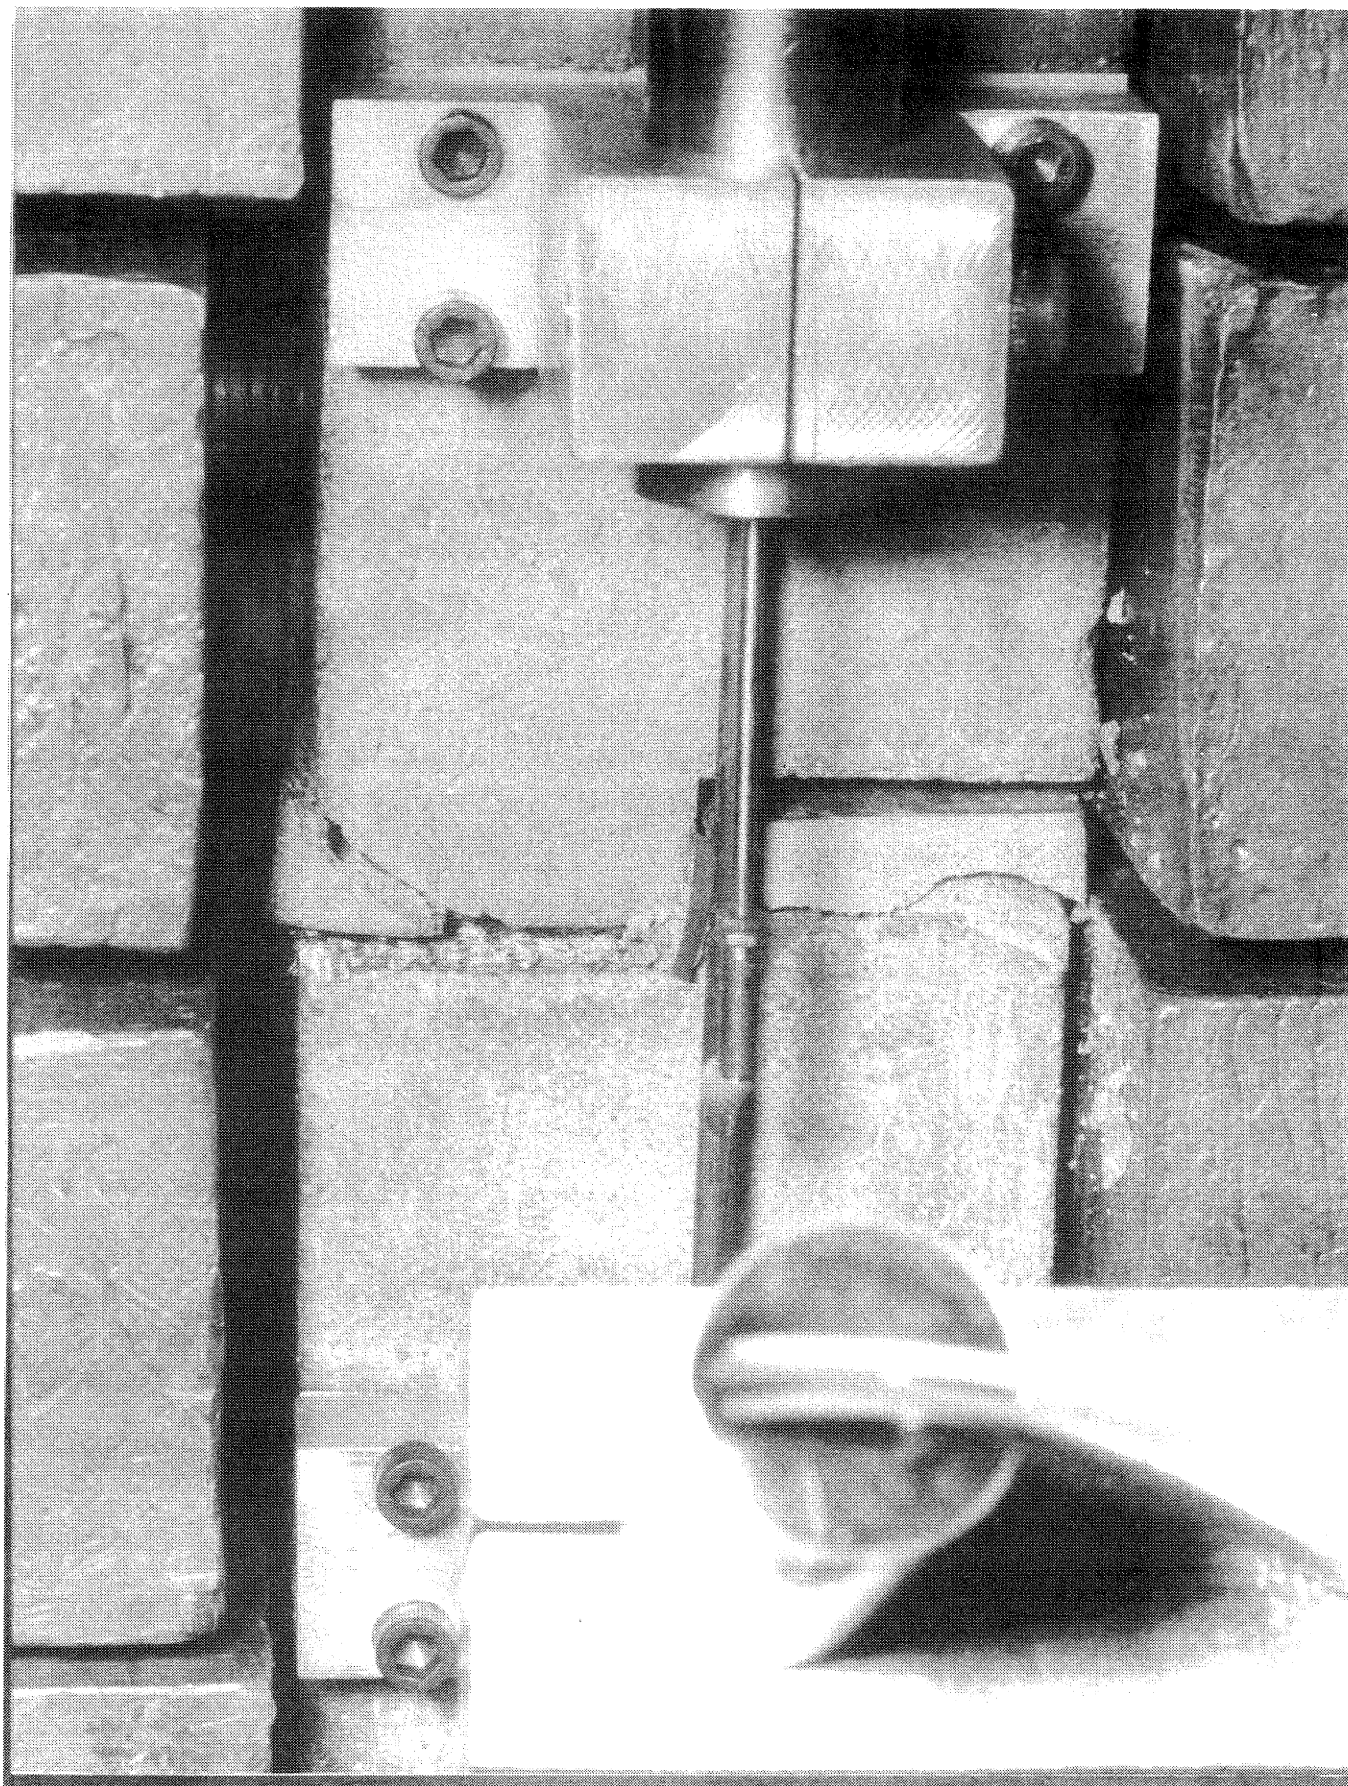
DAMAGED EXPANSION JOINT, TEST Y5B.
